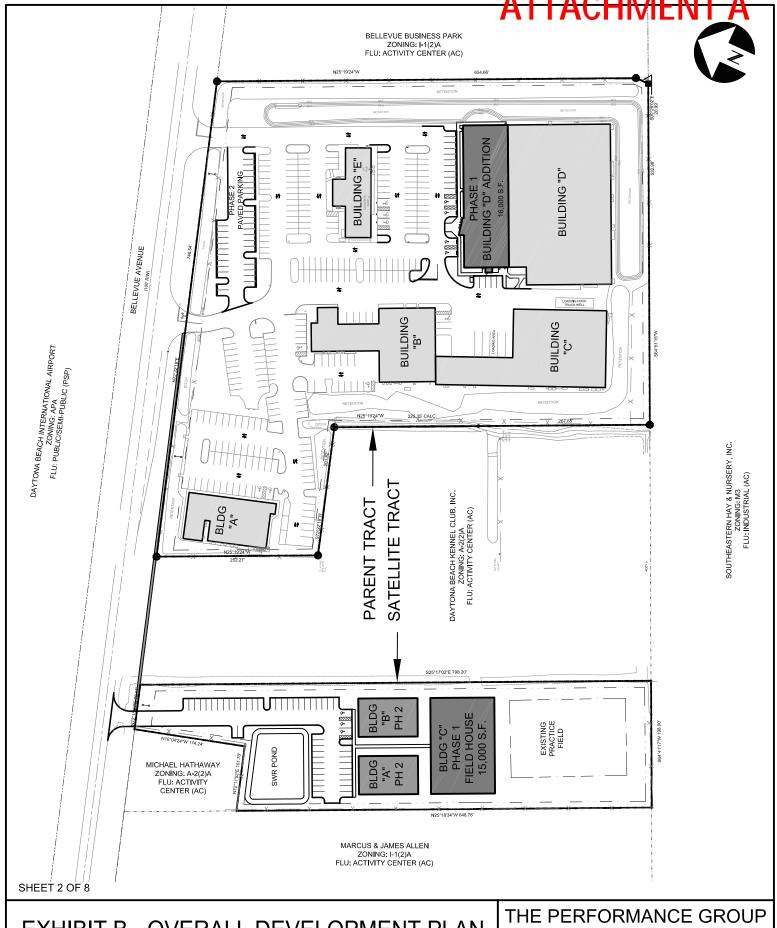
EXHIBIT B - OVERALL DEVELOPMENT PLAN
